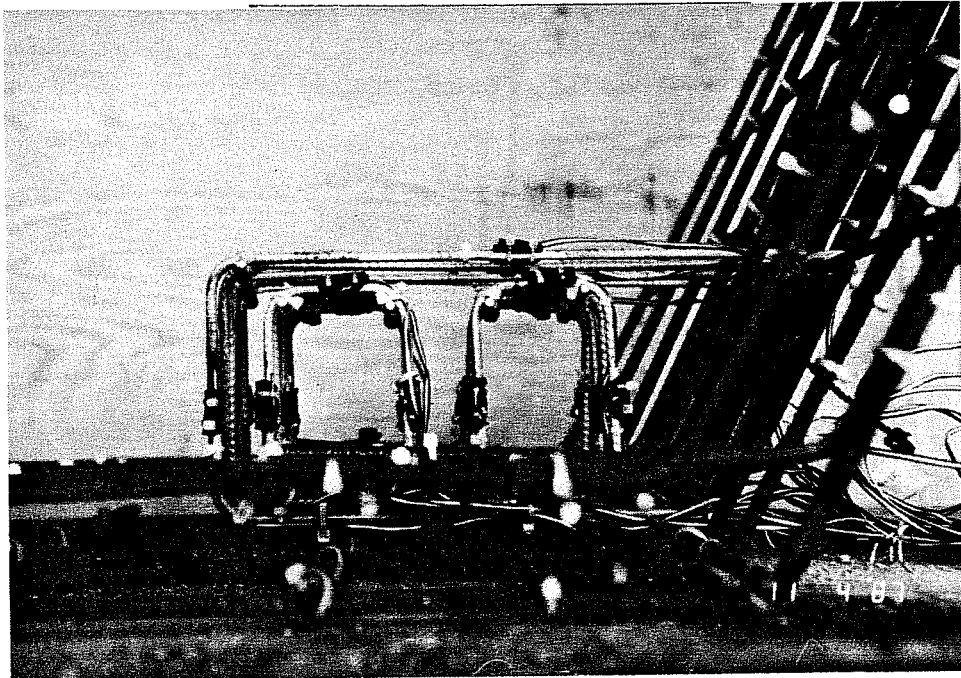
Specimens 5A and 5B Reinforcement Cage
